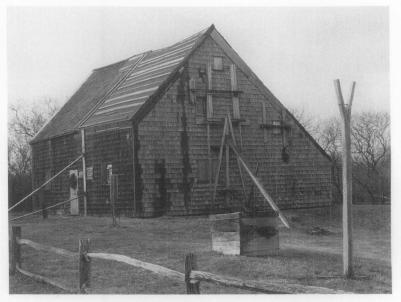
Buildings seriously damaged by storms or deterioration may need to be braced before architectural evaluations can be made. Jethro Coffin House. Photo: John Milner Architects.
